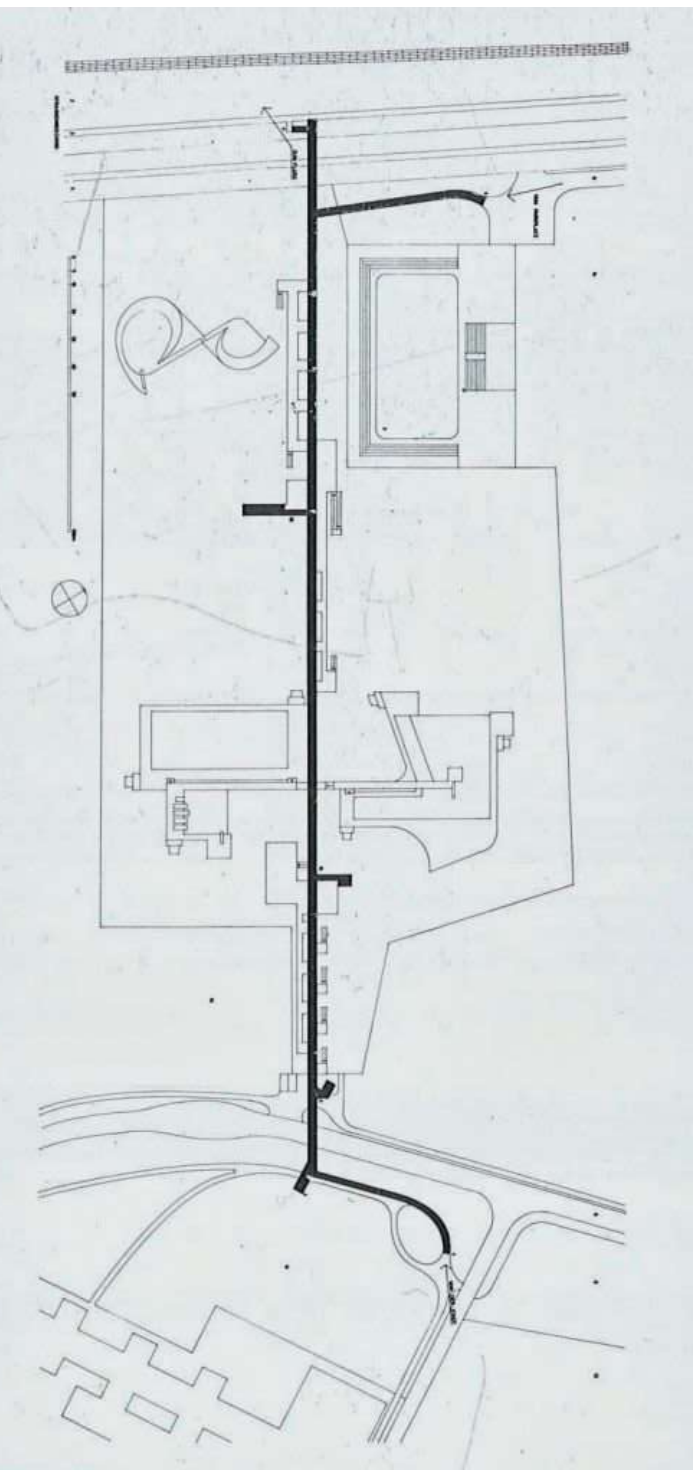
Bellinzona Bathhouse site plan – Aurelio Galfetti, Flora Ruchat-Roncari (www.Hiddenarchitecture.net, 2019)
